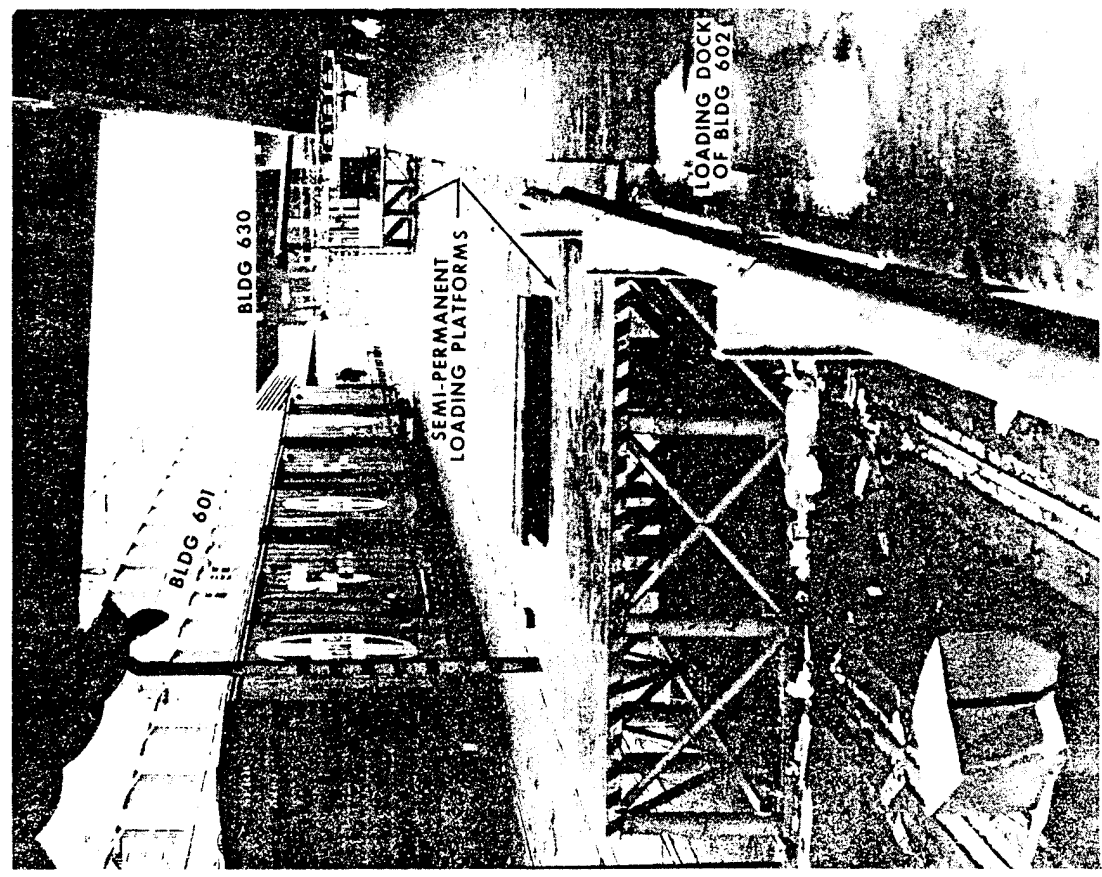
Loading platforms on east side of Building 602 (southward view).
